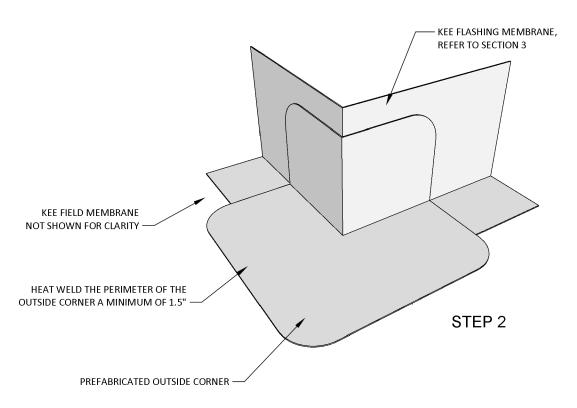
Induction Welded KEE Field Membrane with Prefabricated Flashing at Outside Corner
